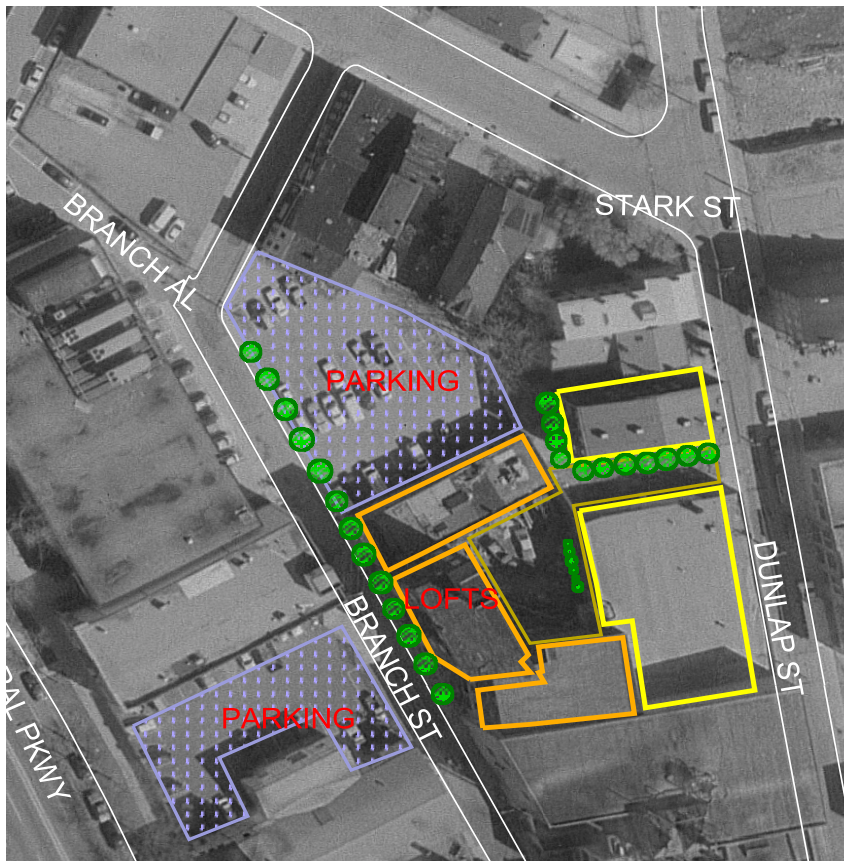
An example of a site plan for a loft development on Branch Street. For illustrative purposes only.
